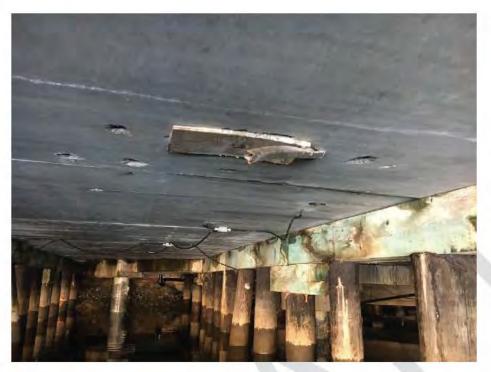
Previous grout repairs to Southeast corner of Panel No. 3 between Bent Nos 23 and 24.
